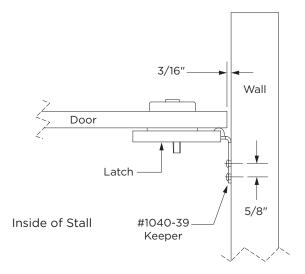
Outswing Door Wall Mount Keeper Installation Detail.
